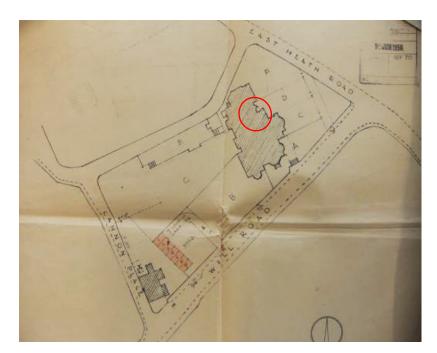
1950 Block Plan showing potential subdivision and new-build in the garden. RIBA Collection.
